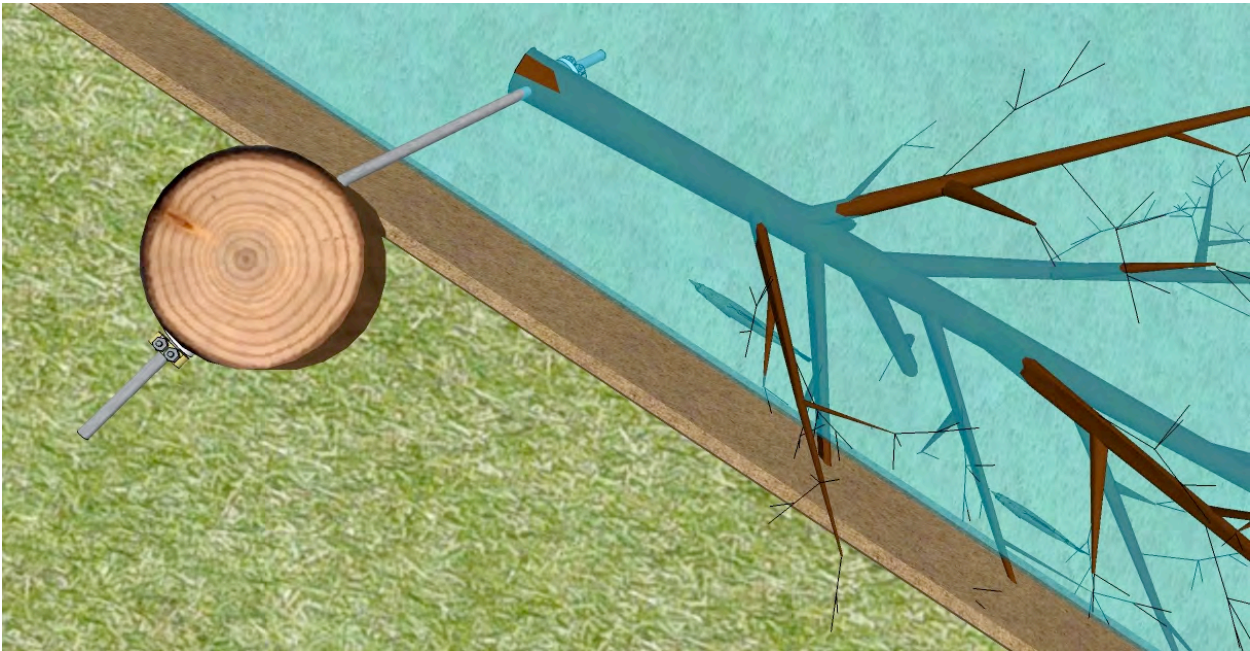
Plan view of tree "kicker" secured to its stump via 12-mm steel cable and cable crimps
